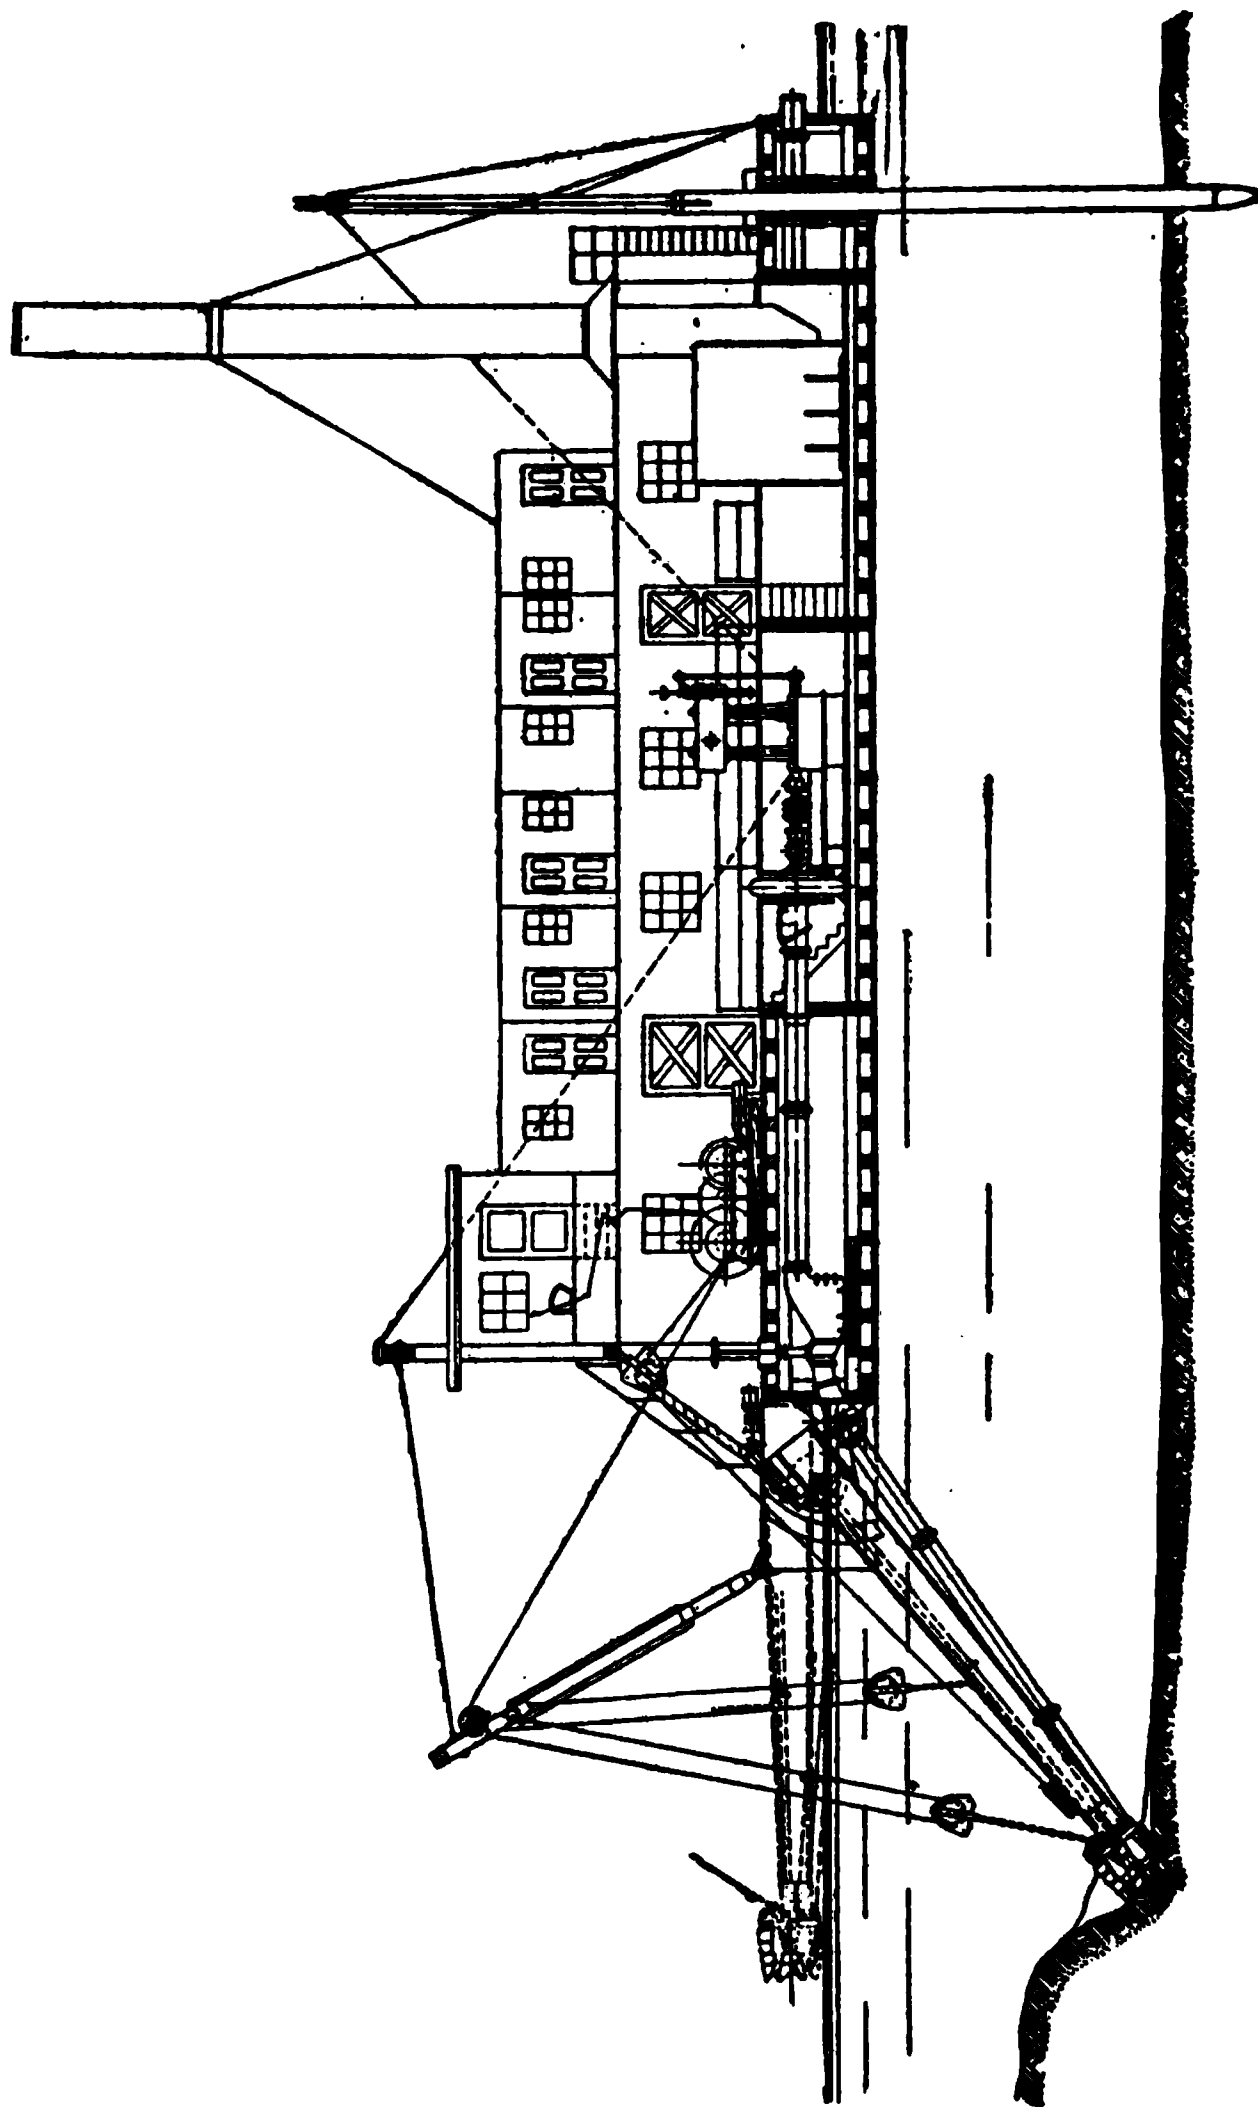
,662.—General arrangement of Norbom hydraulic dredge showing location of boilers, engines, pumps, control machinery, suction pipe and cutter.
